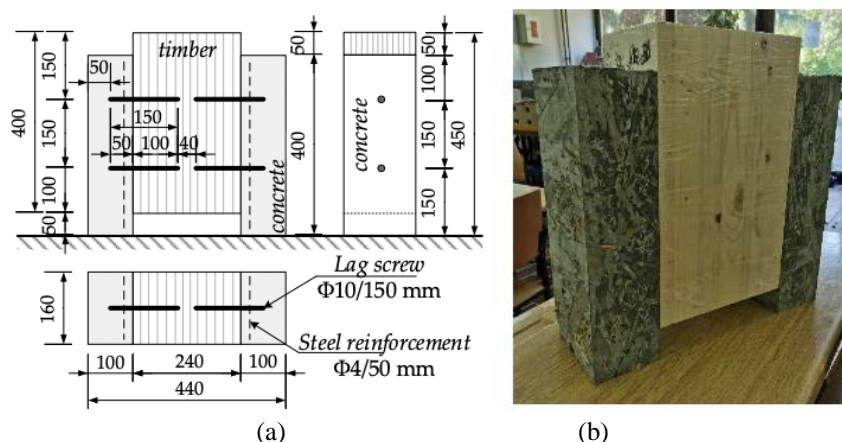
Figure II.- Sample used for FE Modelling (a) Details dimensions of screw connections in double shear specimen and (b) double shear specimen before tested [11]
